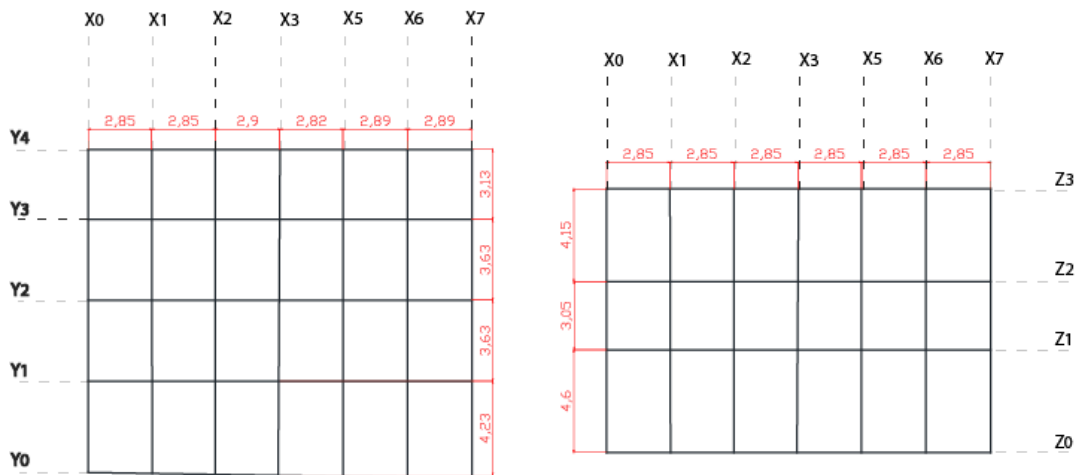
main axis of pombalino structure: (right) elevation view. (Left) floorplan view
